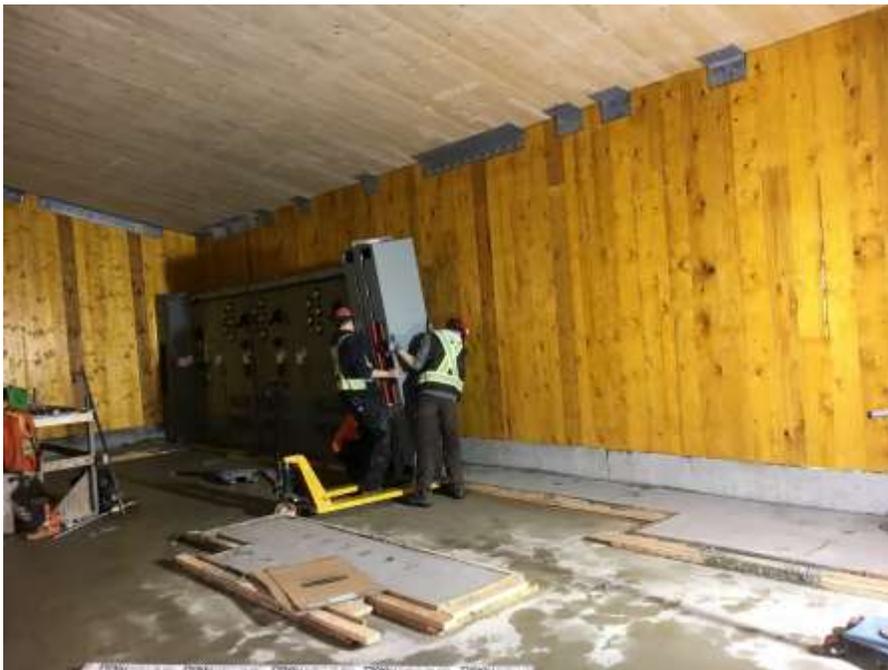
Macaulay Point Pump Station- Installation of motor control centre in electrical room.
